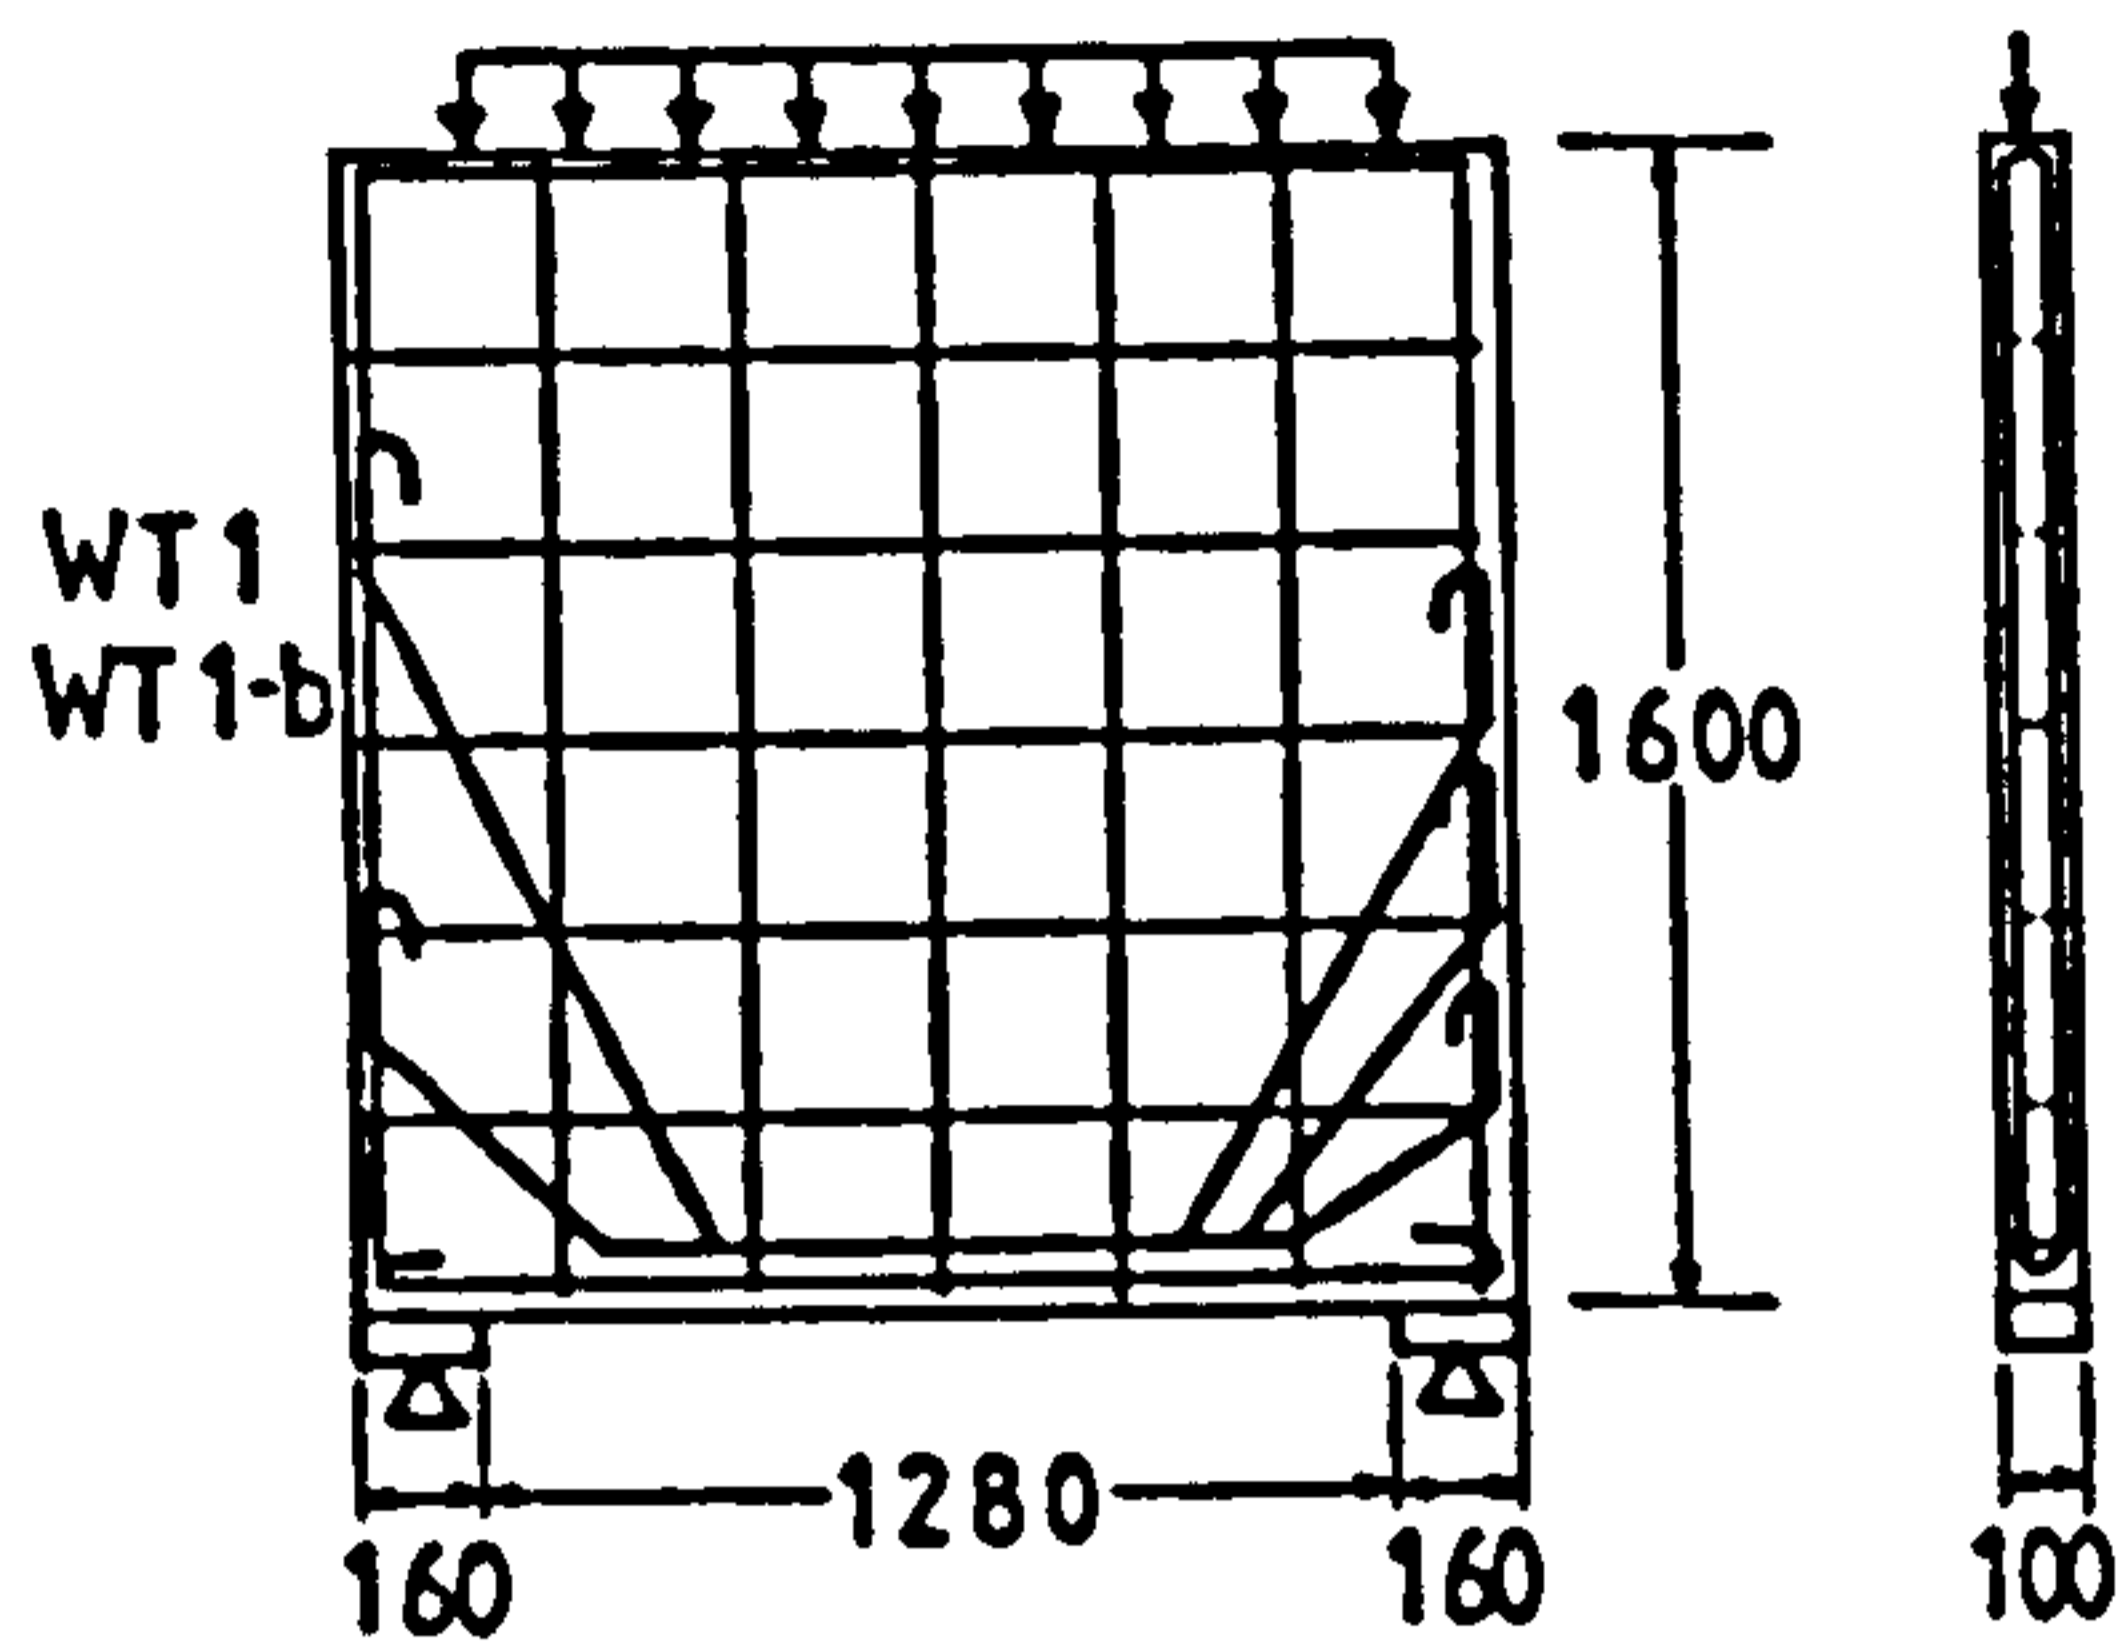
Dimensions and reinforcement details in deep beams with load on top. From Leonhardt and Walther (1966)
